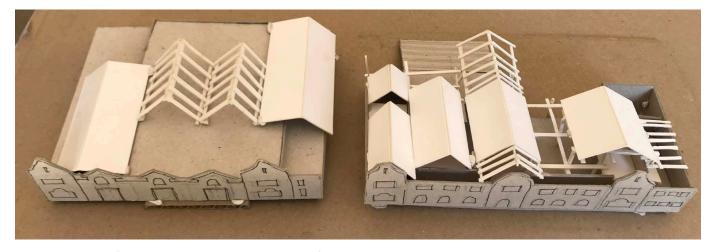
Final Design Maquette Iterations (Author 2020)
